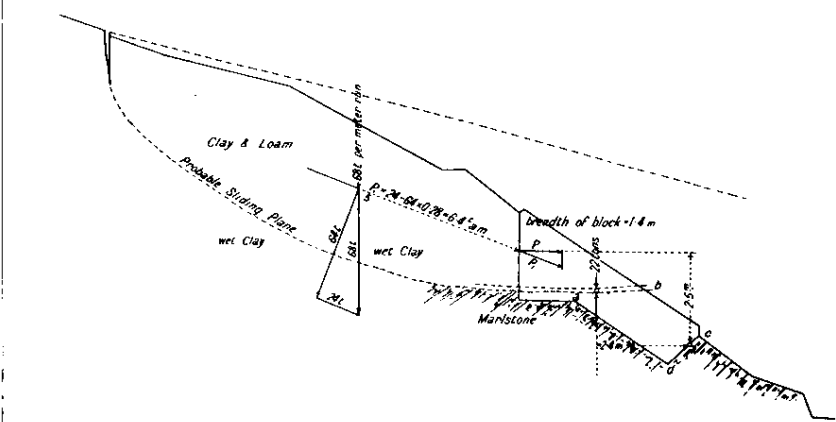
CROSS SECTION OF SLIP AT KM. 2.56
